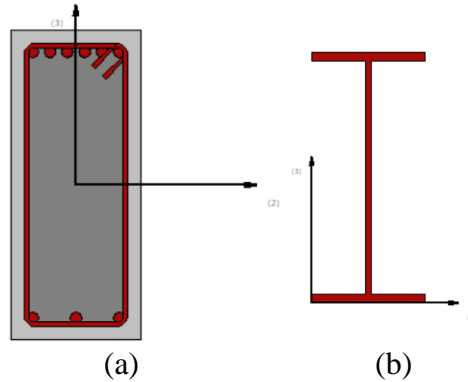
a) Reinforced concrete beam, and b) Steel beam element section model view from SeismoStruct (SeismoSoft 2018).
